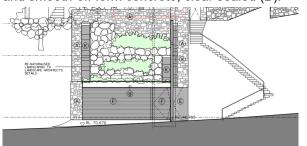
Extract of the proposed garage door showing materials (Source: HSA)
